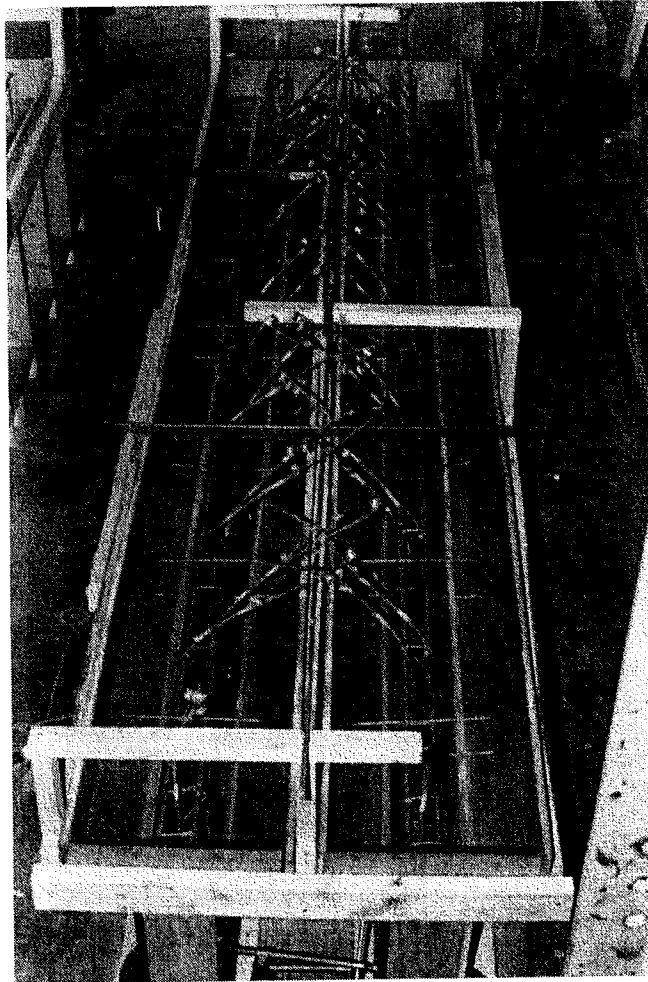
Formworks and Bar Placement Prior to Casting the Concrete
